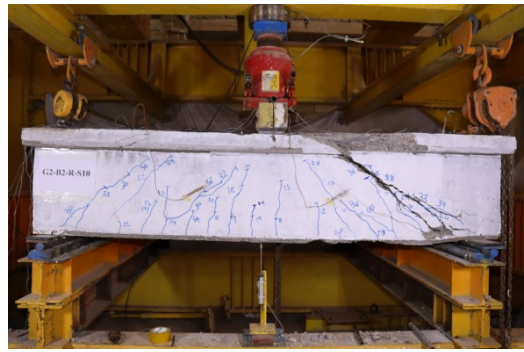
Failure crack pattern of specimen G2-B2-R-S10.
